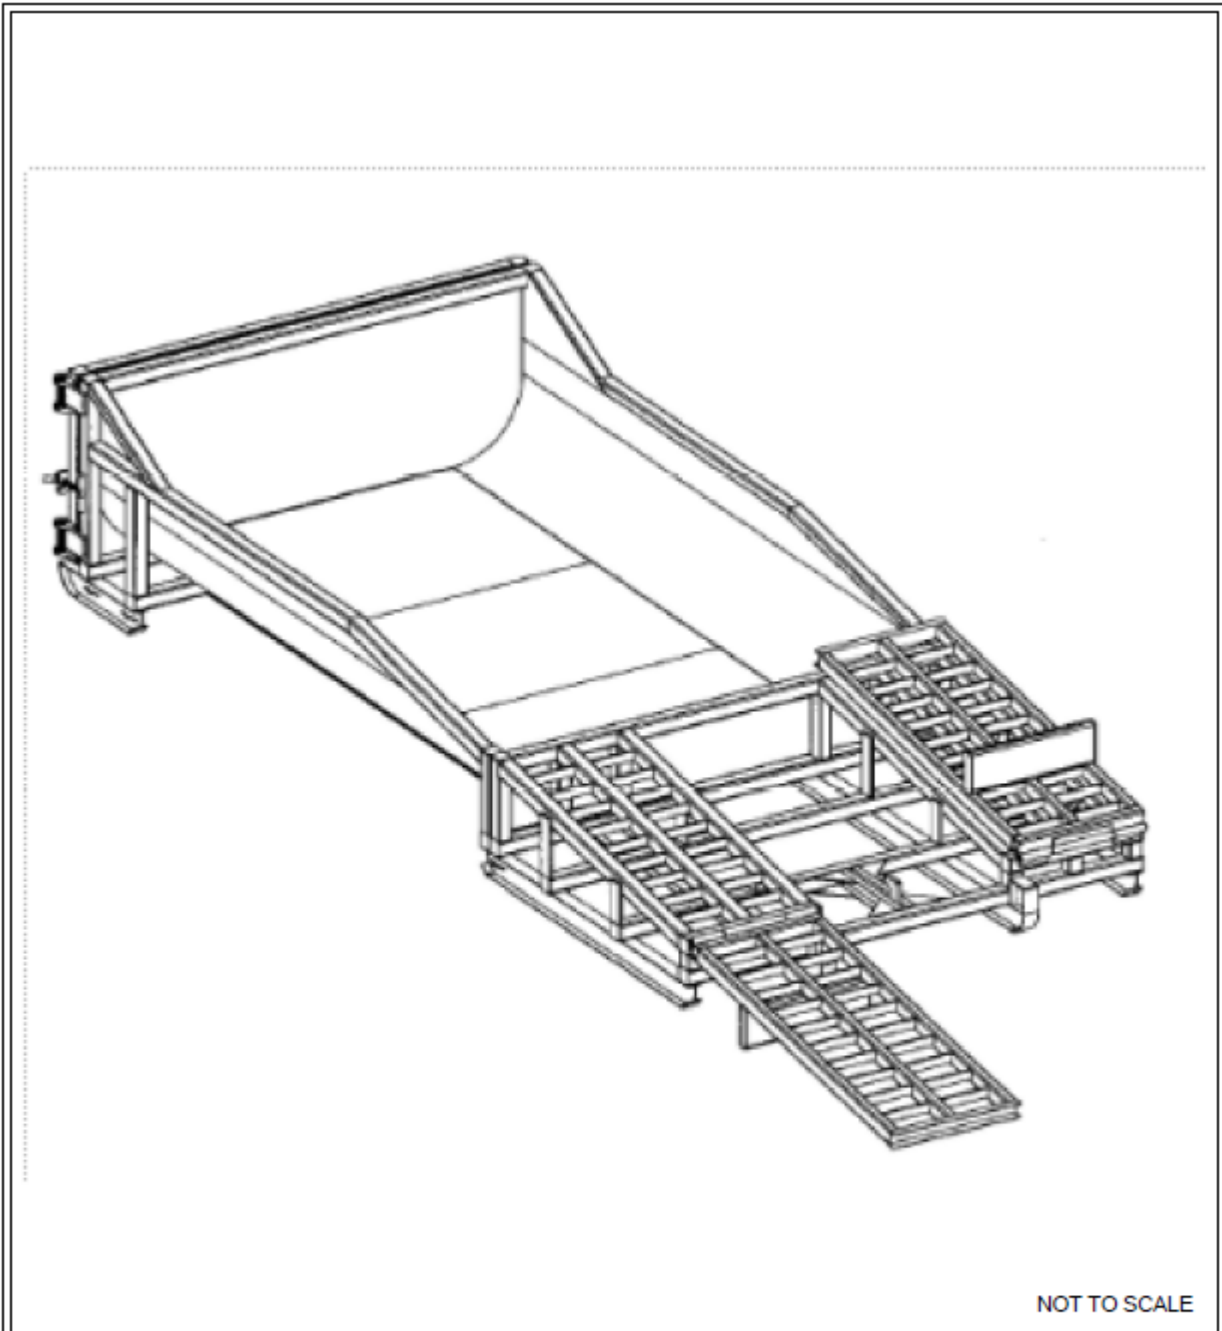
Concrete Washout Area with Wood Planks
